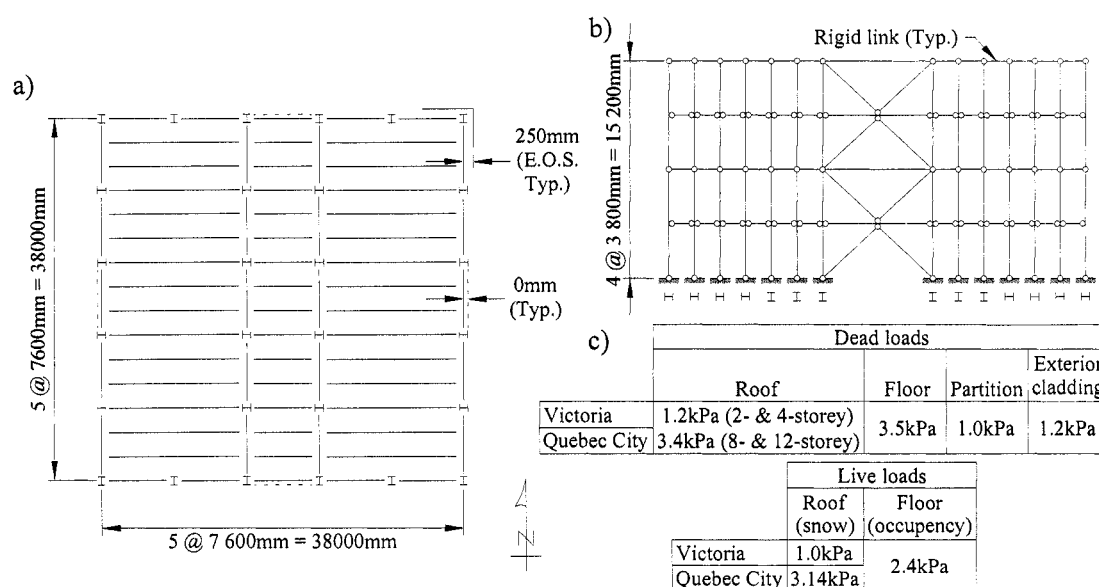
(a) Plan view of the R-building; (b) Braced frame elevation and analytical model for the 4-storey R-building; (c) Building design loads.
